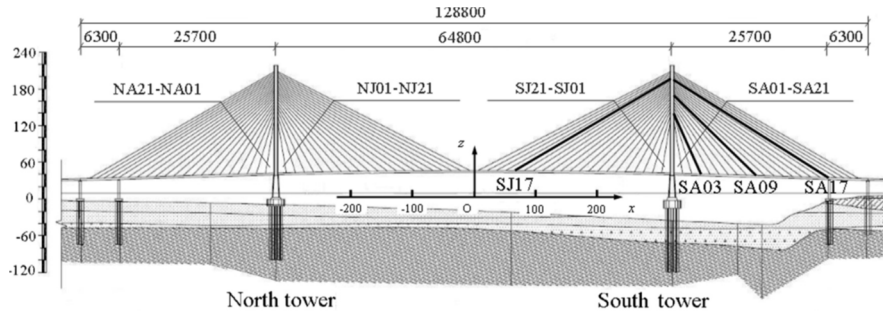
Elevation of the bridge and cable numbering (Units: cm, except height in meter).
